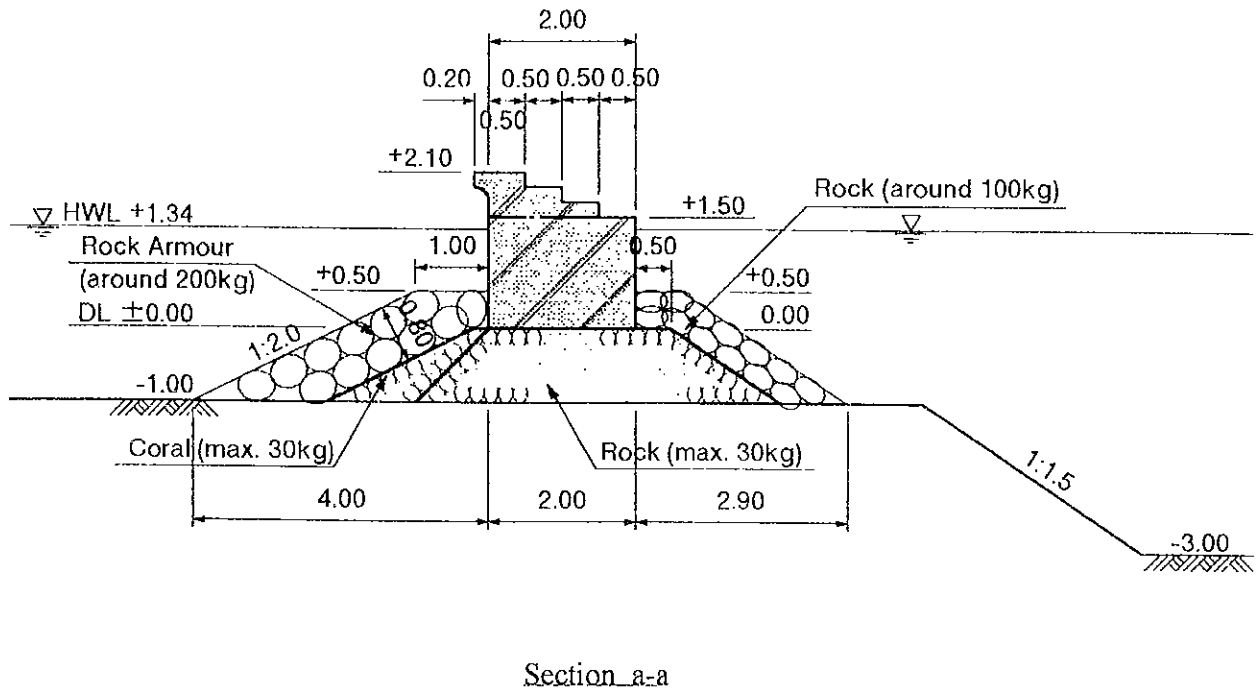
Standard Cross Section of Seawall - Type B
